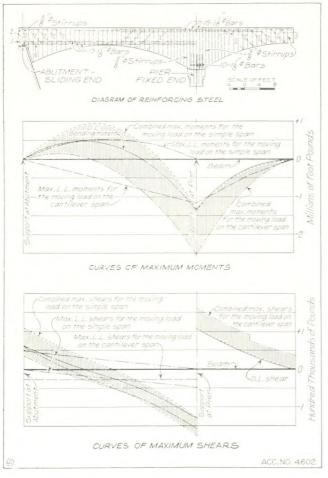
THE CANTILEVER GIRDER AT TAYLORSVILLE.
